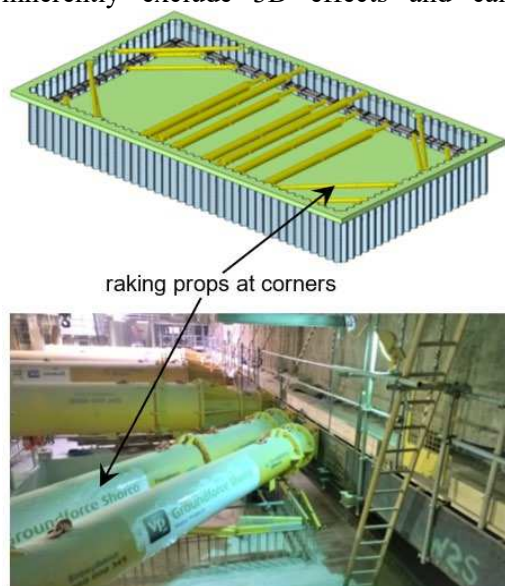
Heavily braced excavation at Crossrail Paddington station (after Chambers et al., 2016).
